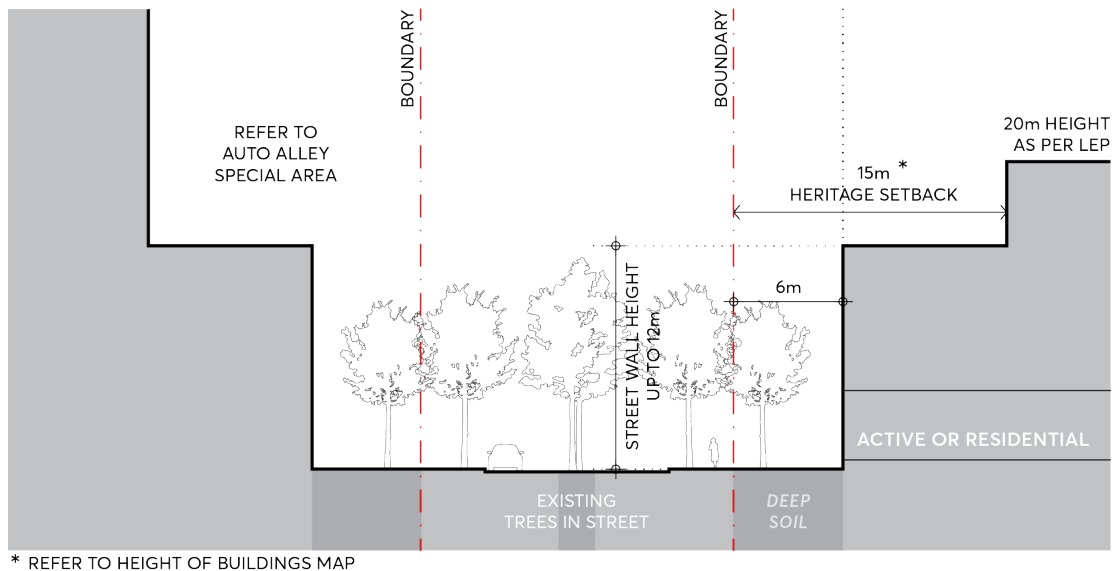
High Street (Section B) Setbacks and Street Wall Height
